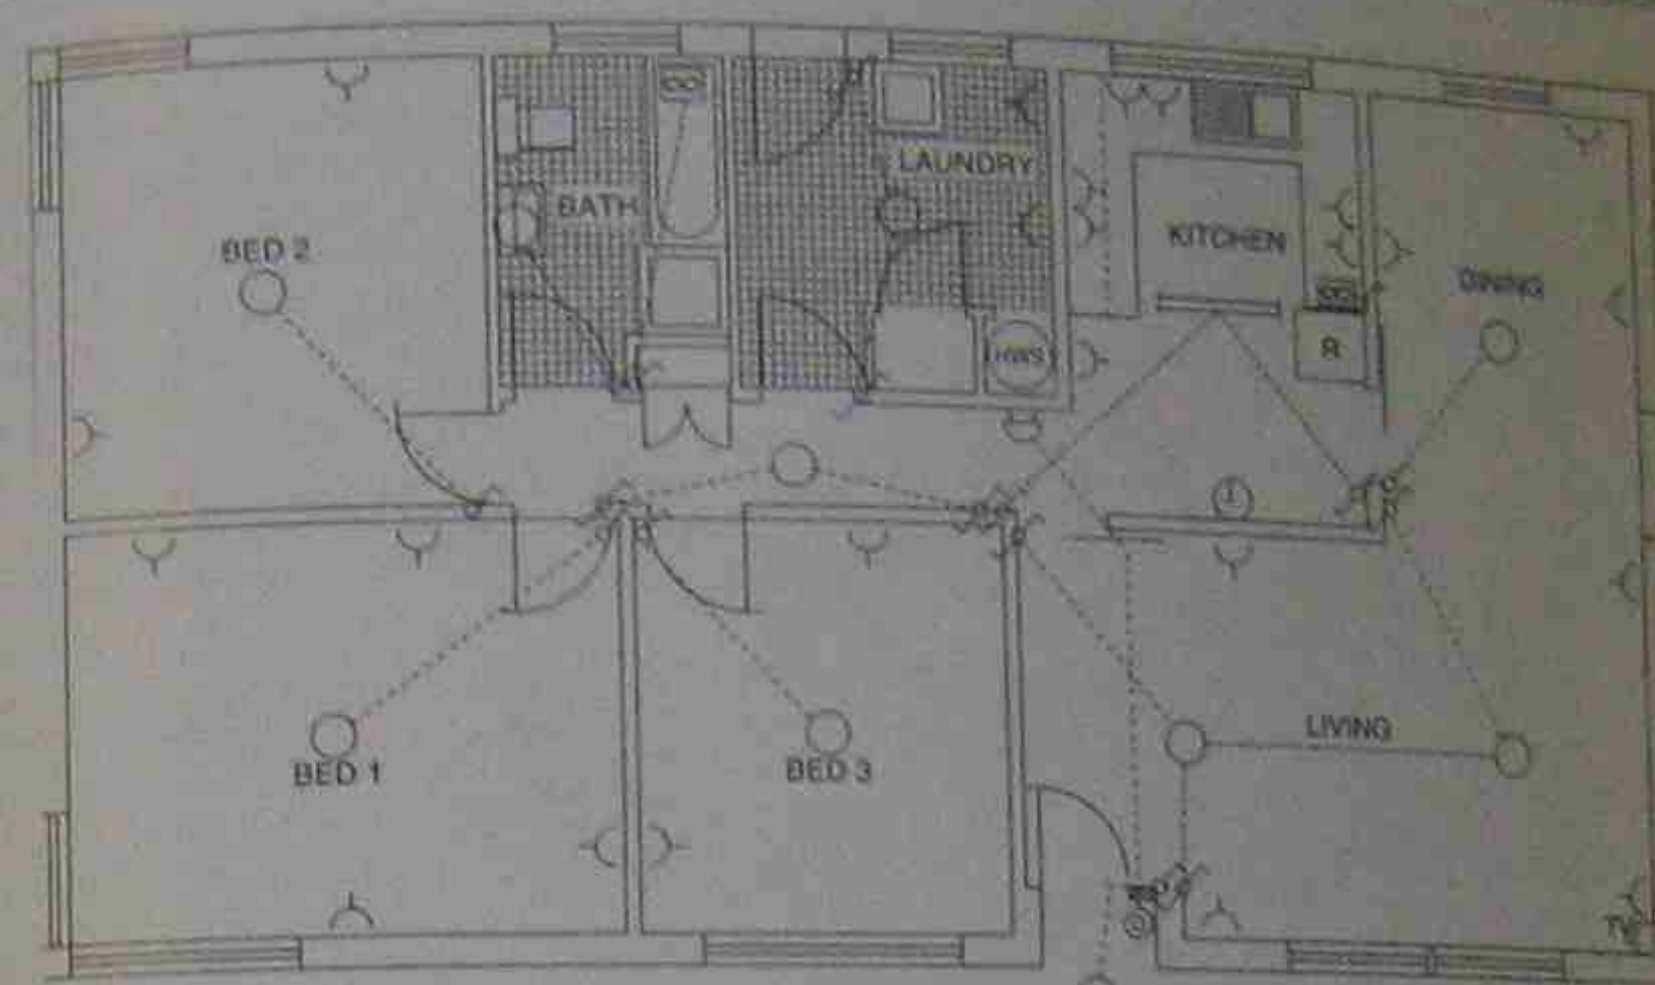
• Architectural electrical floor plan of a small domestic residence
